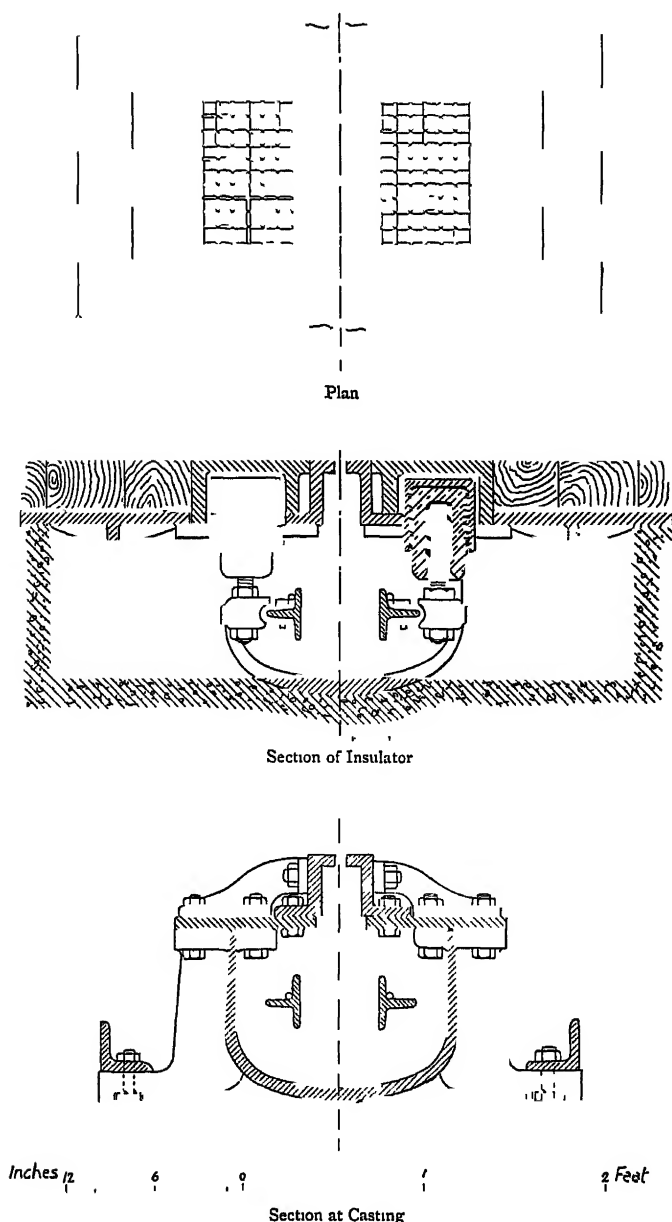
Special Shallow Conduit, Pont de l'Alma, Paris
